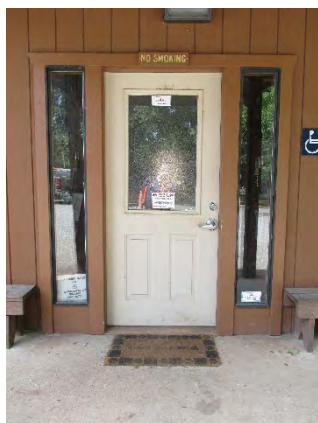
Main pedestrian entrance to the headhouse on its northern elevation. Photograph taken 6/25/2019.
